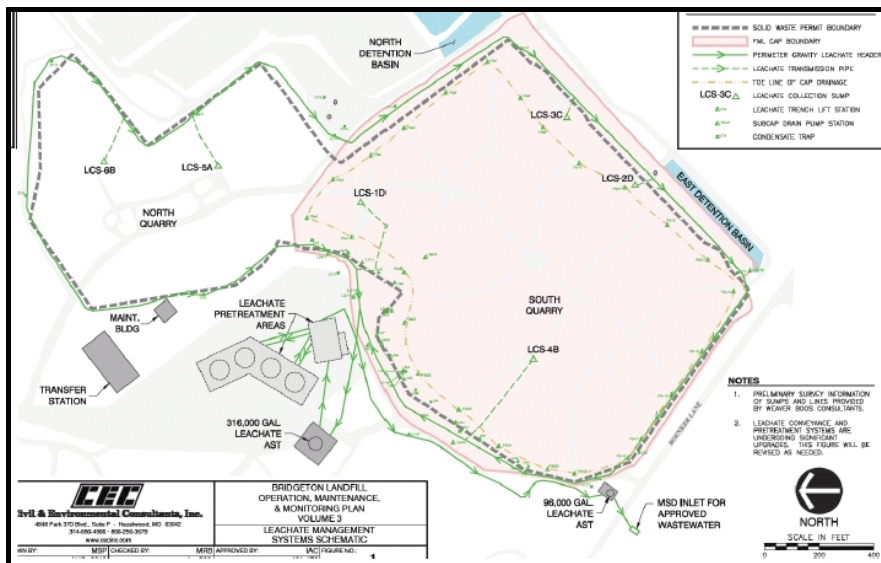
Location of original sumps pumps in Bridgeton Landfill [NOTE: North to left]
